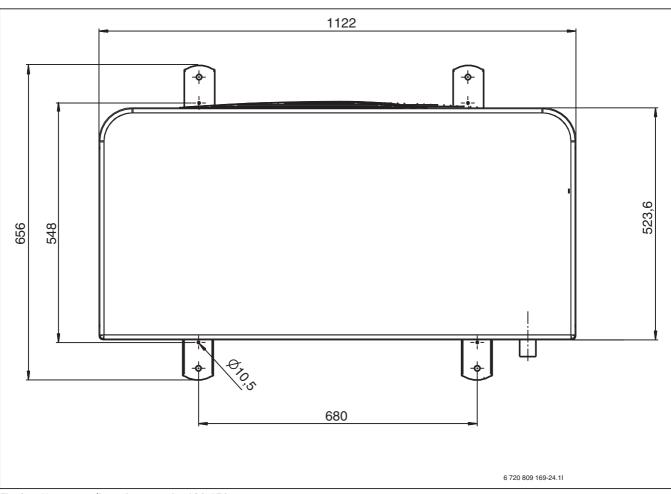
Heat pump dimensions and connections, rear size 130-170
